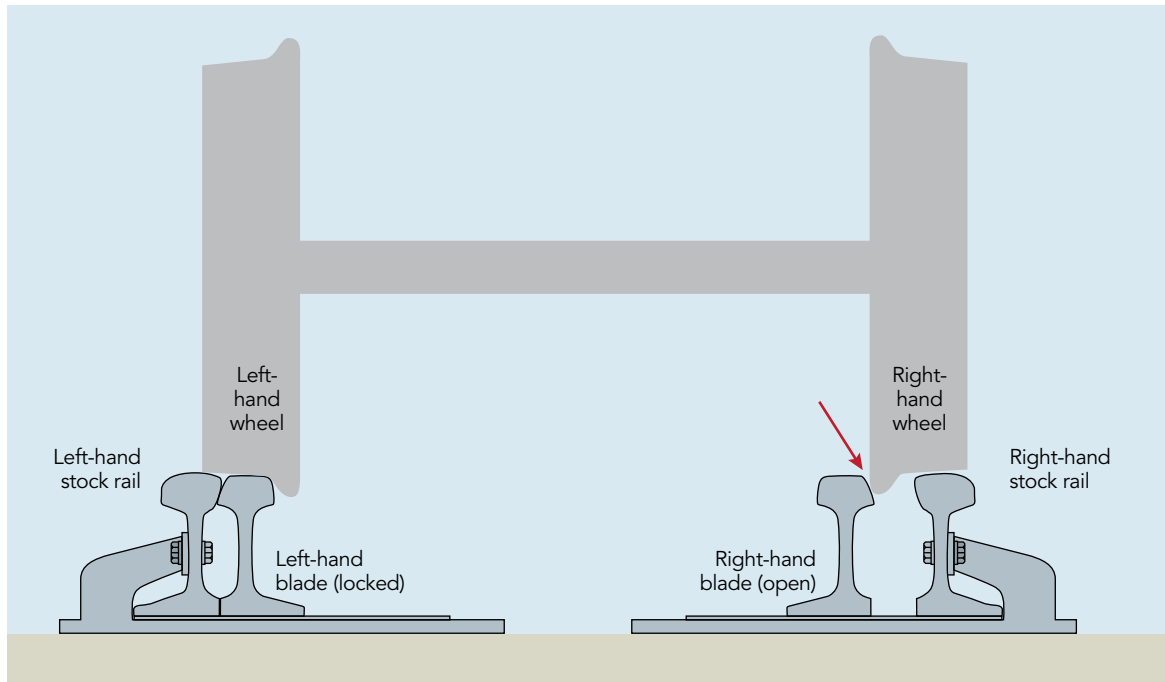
Flange-back contact marks occur when a switch blade in the open position is located so close to the stock rail that passing train wheels come into contact with it.
